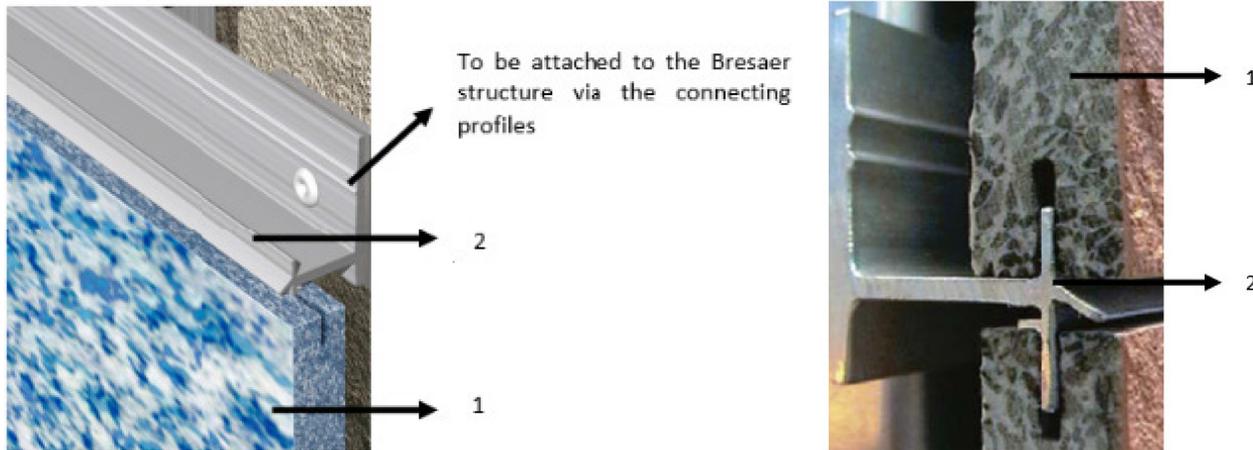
Lightweight ventilated façade (ULMA façade) details
